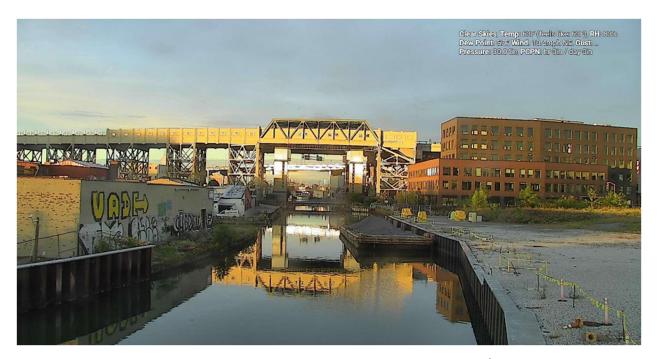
September 30, 2024. General Conditions in Canal north of 9th Street Bridge prior to work activities at 06:52. Light sheens noted.
